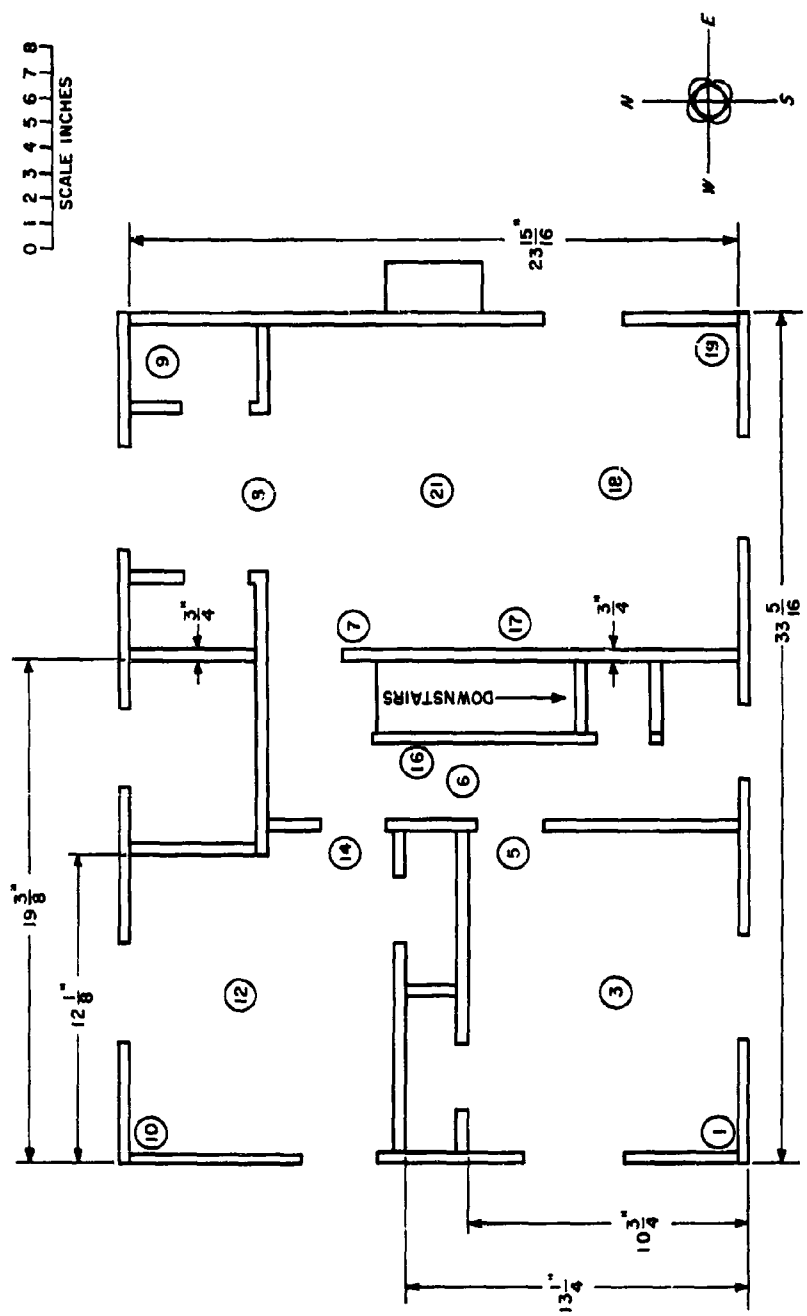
Plan View Giving Dosimeter Positions for the Second Floor of Two-Story Model House
